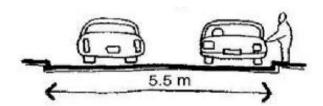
Liveable Neighbourhoods 5.5m pavement width
